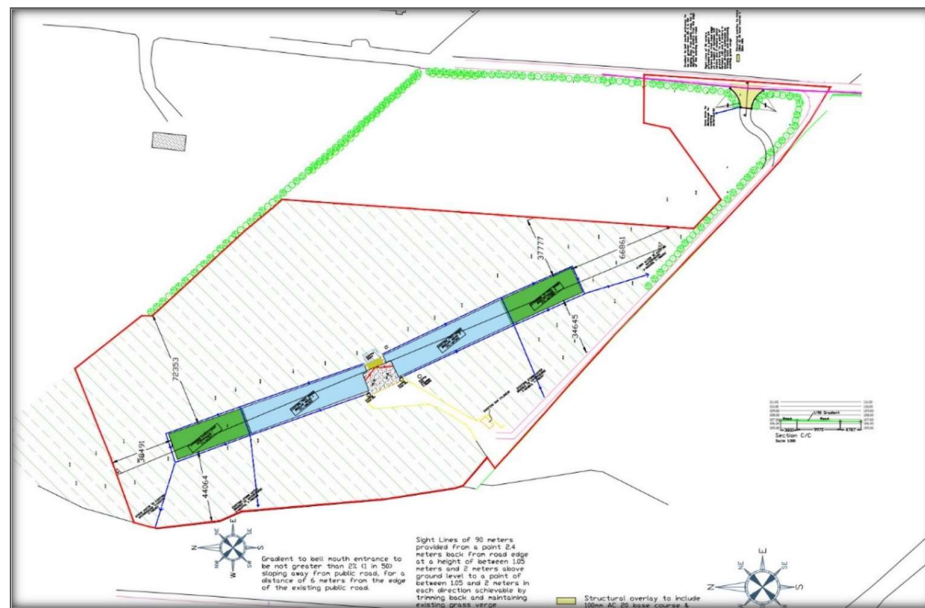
Proposed Site Plan (as Prepared by Horizon Group)
